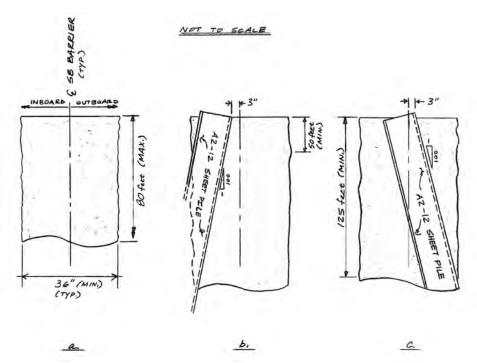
Assessment of Verticality of Sheet Pile Wall: (a) Existing SB Barrier; (b) Sheet Pile Installed at Inboard Limits; (c) Sheet Pile Installed at Outboard Limits
